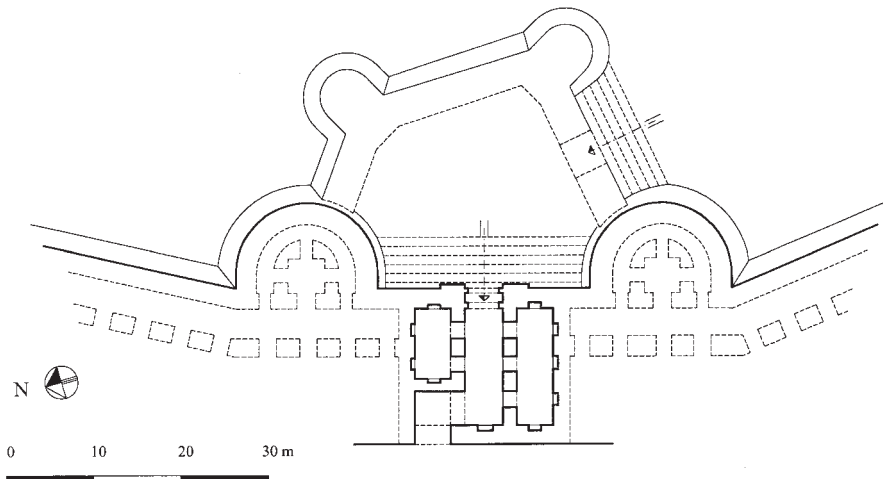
Bandāolī Gate to the east of the town, sketch plan.
